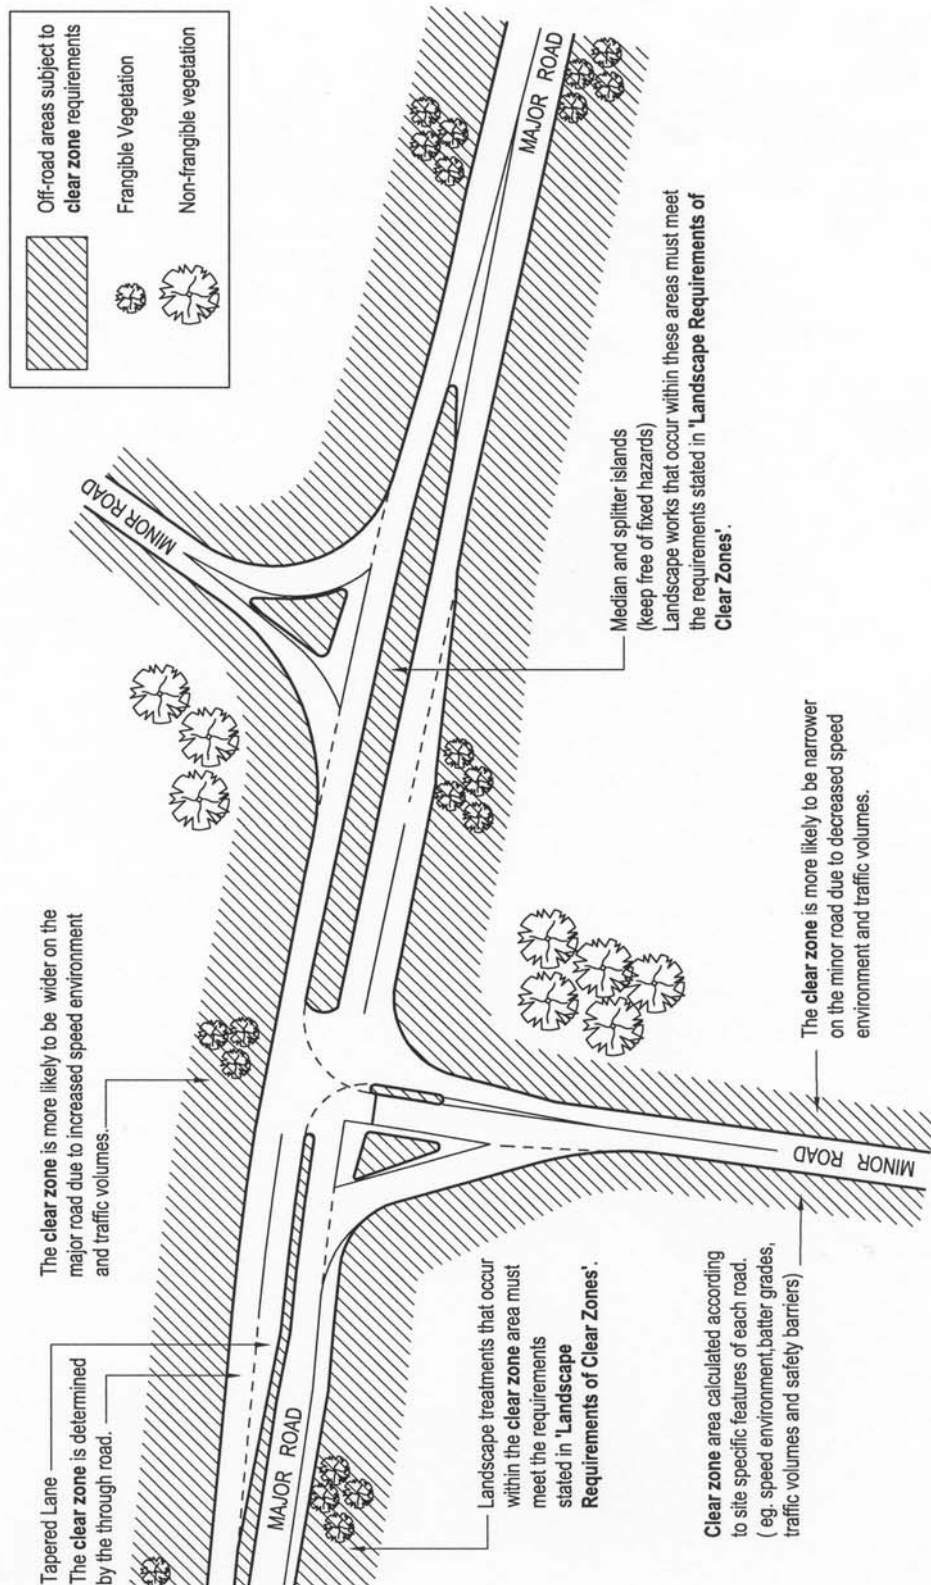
Off-road areas subject to clear zone requirements at an intersection – Plan
